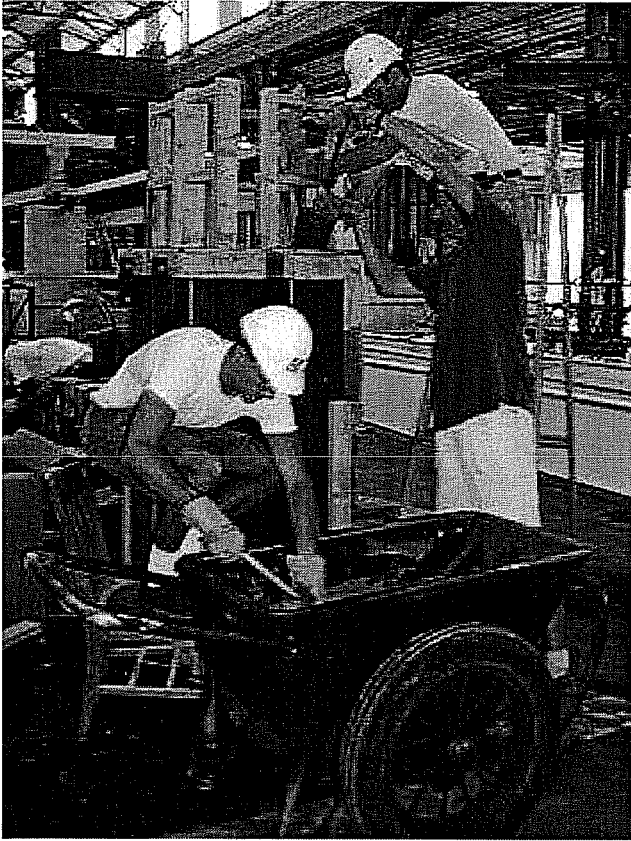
Depositing the concrete inside the hollow steel tubes.
